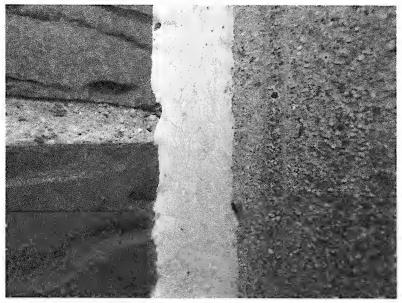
Crazed, hard, and brittle sealant in corner joint at west facade
